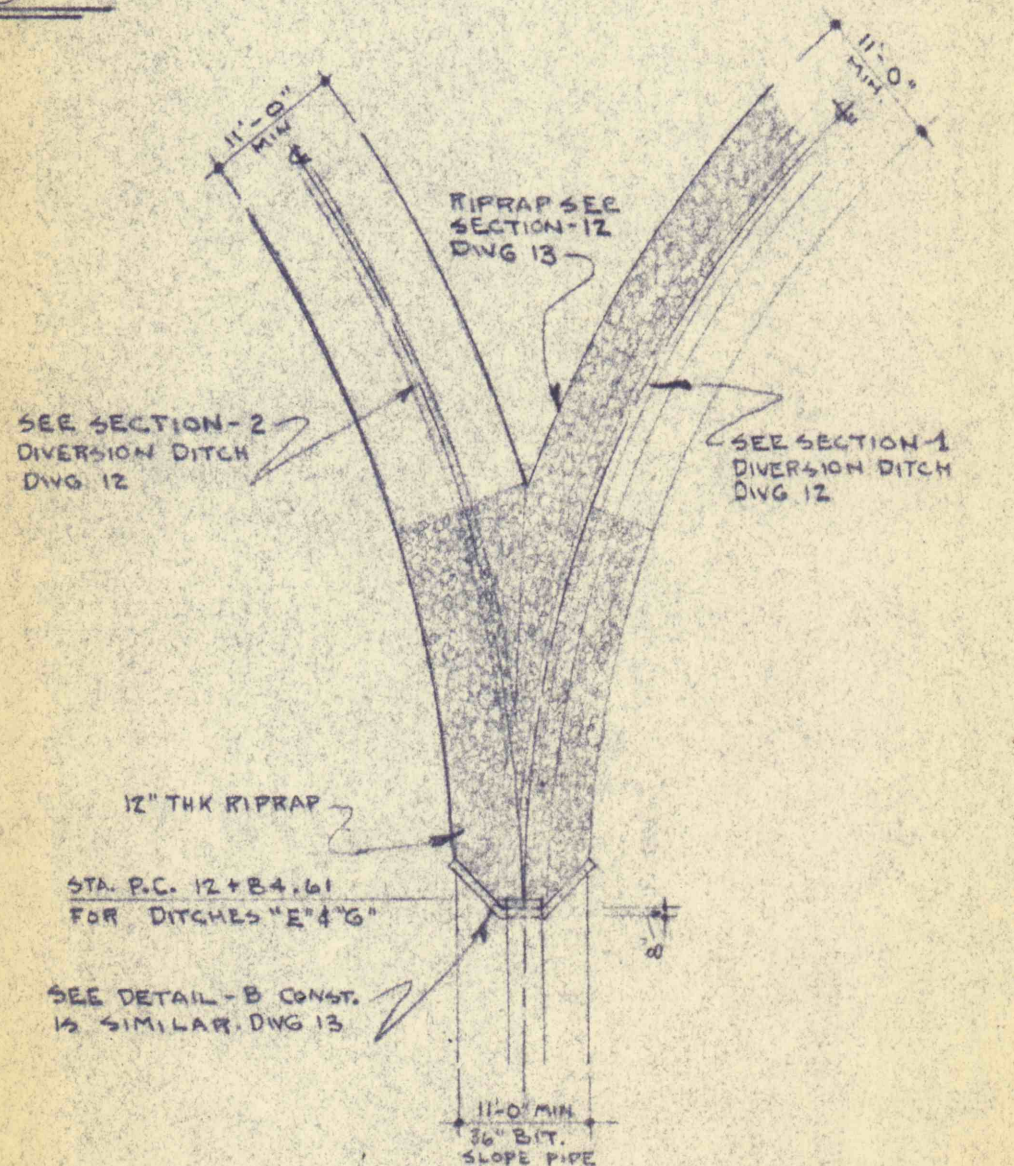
DETAIL OF TYP. HEADWL AT 36" PIPE - (O)
